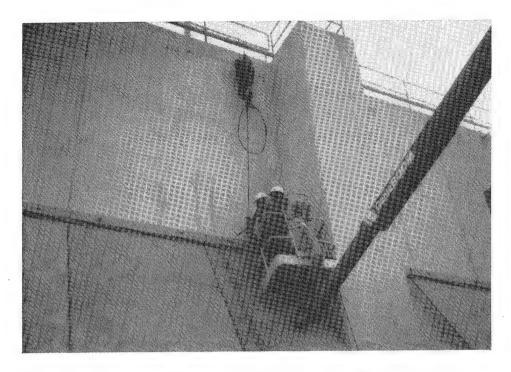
Precast headcap installation at top of panels, Lockport Lock
